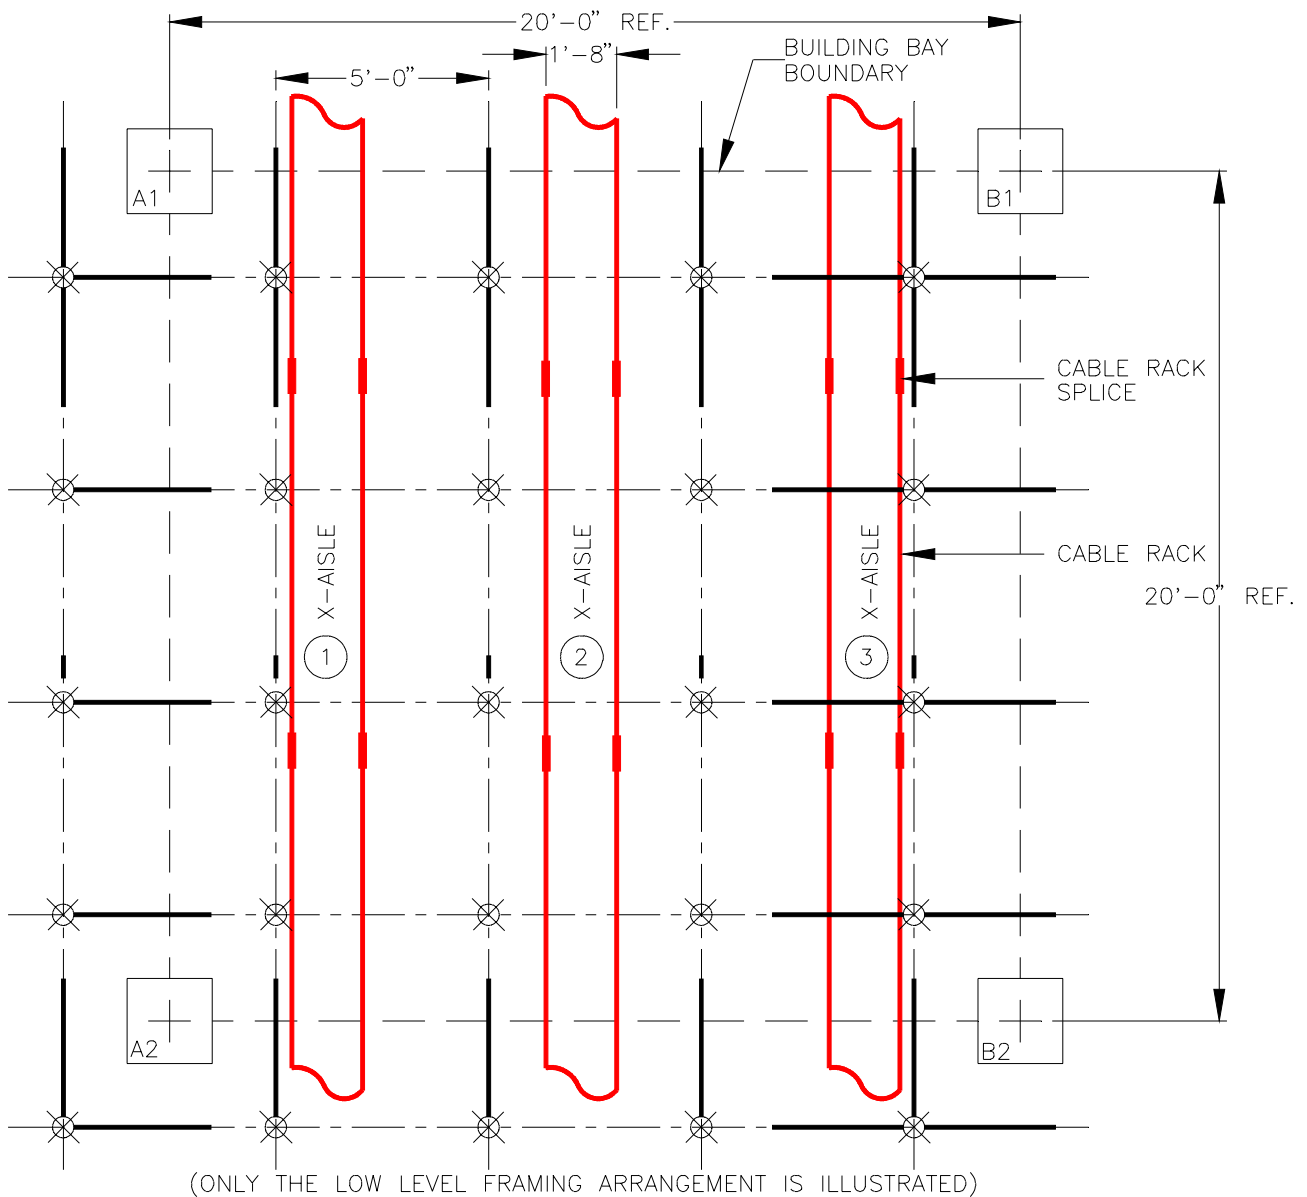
Typical Auxiliary Framing And Cable Rack Arrangement - Switching Areas
